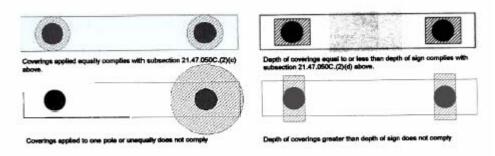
Examples of pole wrap. Poles depicted in plan view.
